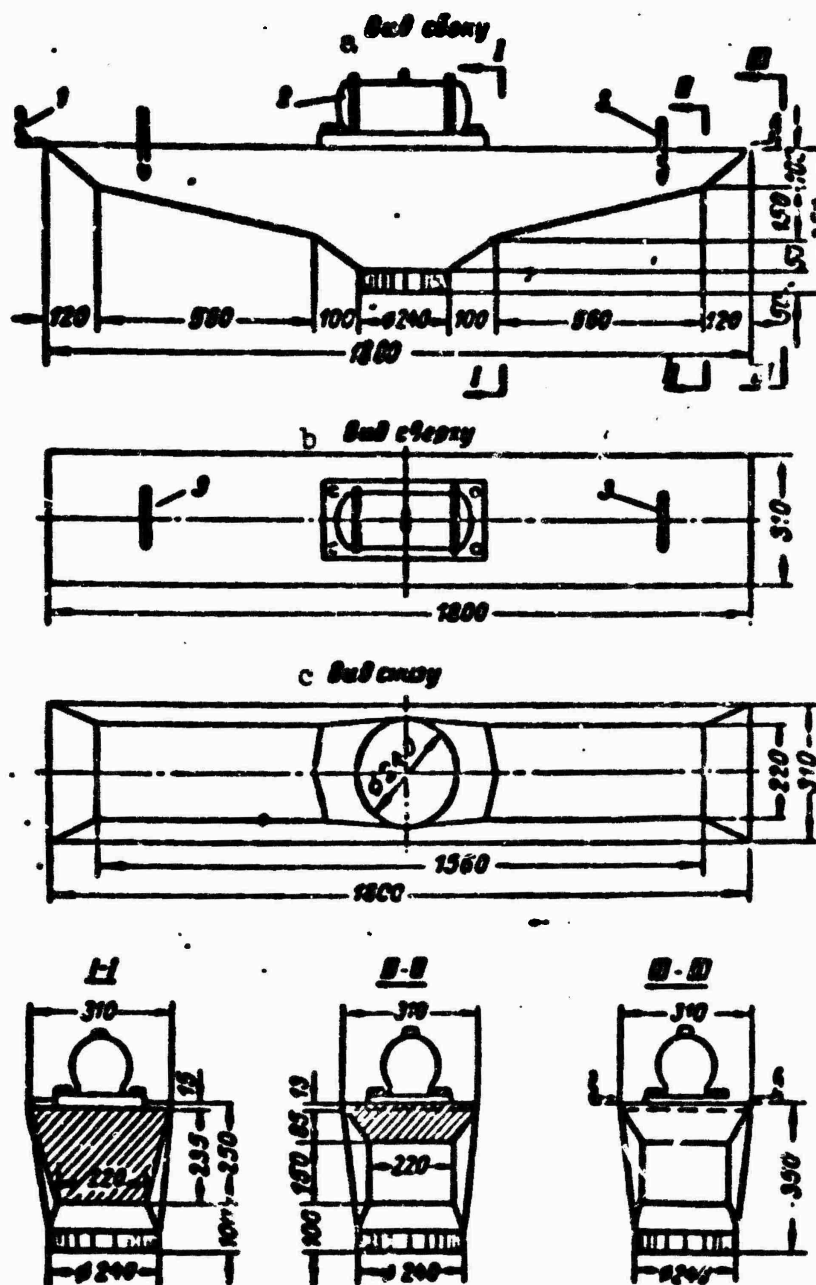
Vibrating frame for constructing a storm sewer. 1) Bearing frame (made from angle steel); 2) the I-117 vibrator; 3) lever (metal, $d = 16$ mm). a) Side view; b) top view; c) bottom view.
